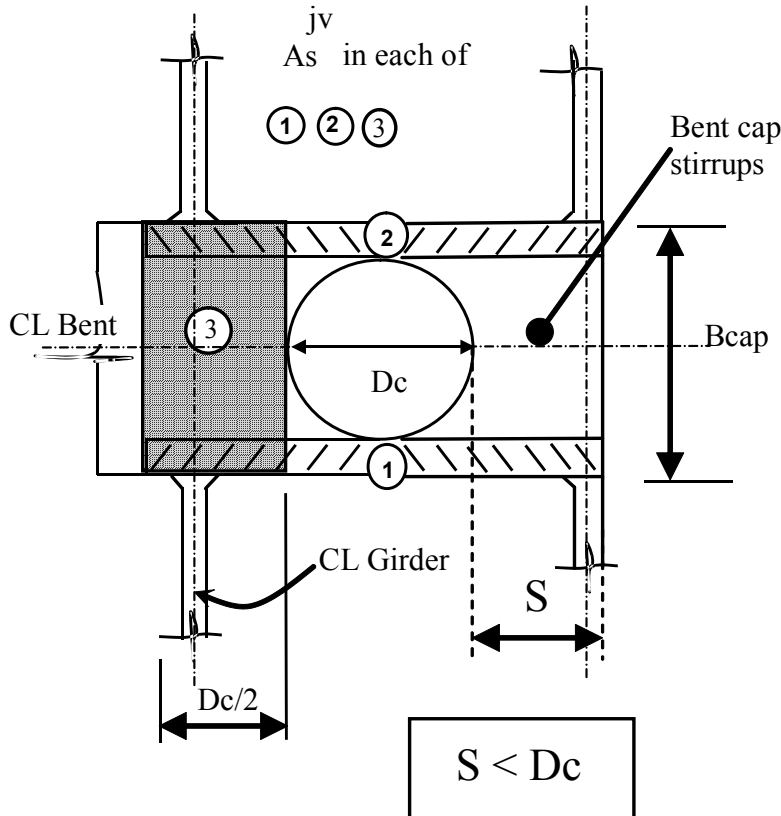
Location of Knee Joint Vertical Shear Reinforcement (Plan View)
